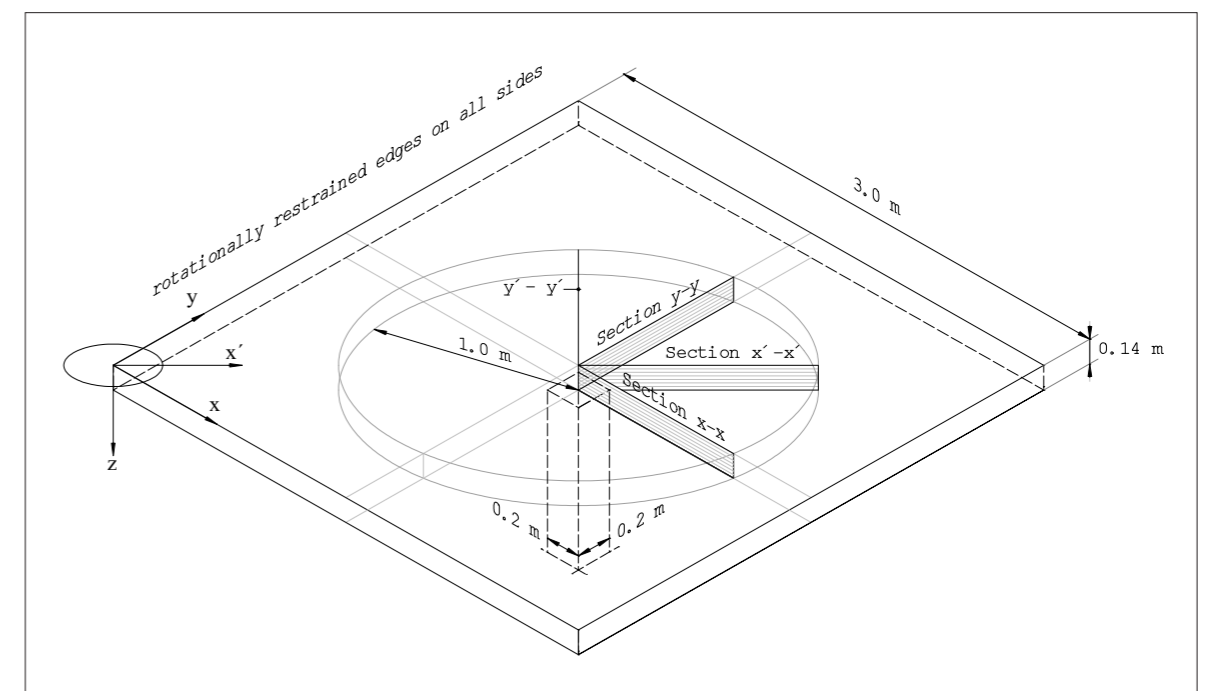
Fictive circular and longitudinal design sections within the centric point-supported mass timber slab
